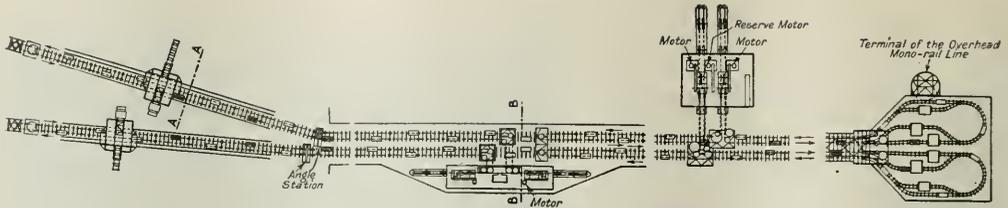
PLAN OF THE TWO CHAIN HAULAGE PLANTS BRINGING LIGNITE FROM THE WORKINGS TO THE POWER HOUSE
